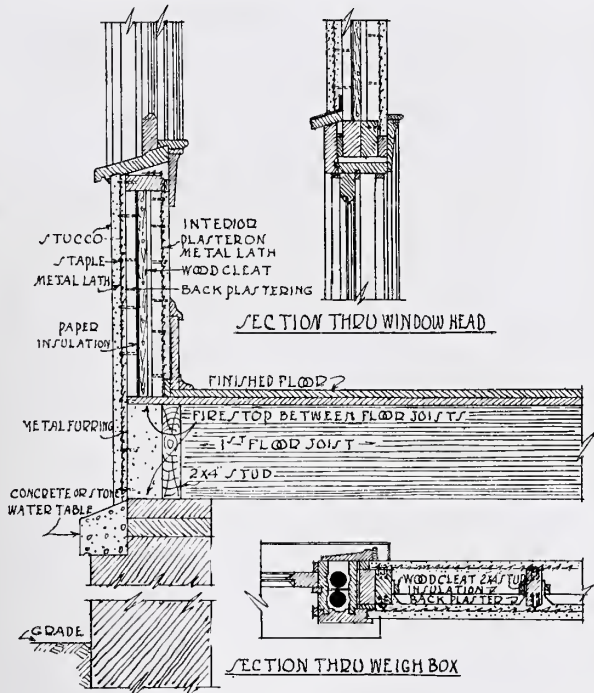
DETAILS OF CONSTRUCTION FOR WINDOW OPENINGS, BACK PLASTERED TYPE WITH FLAT OUTSIDE TRIM
